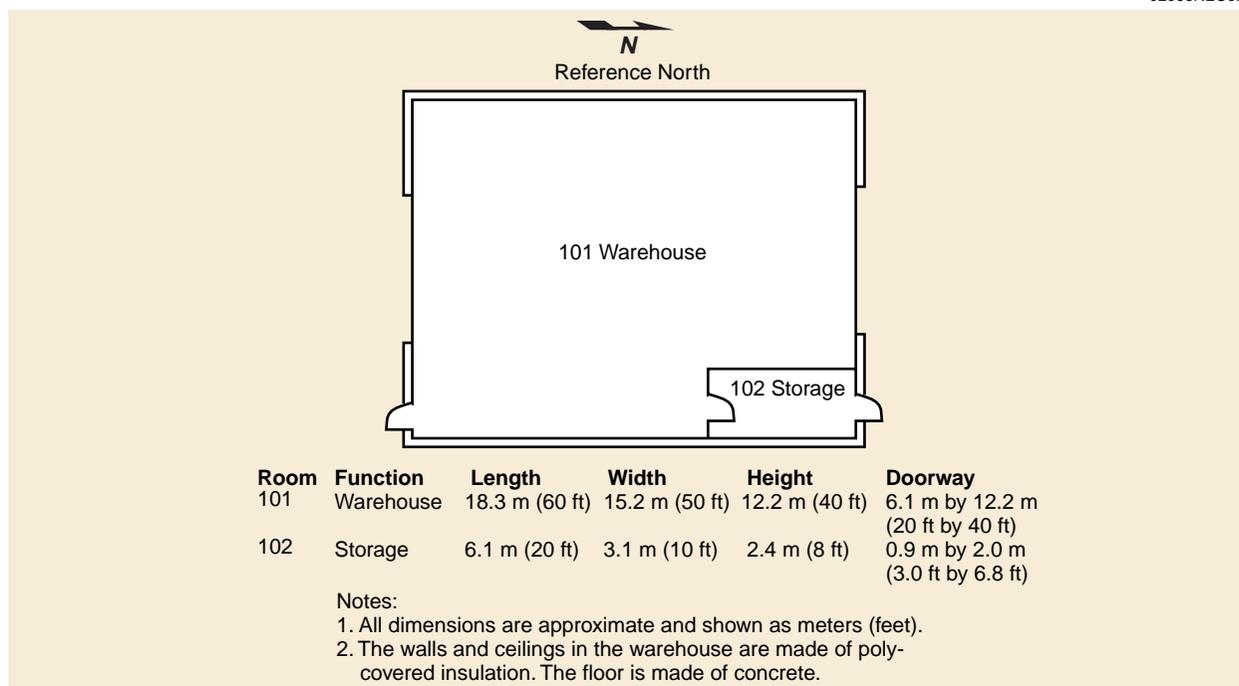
Building 6 Detailed Floor Plan, Astrotech
